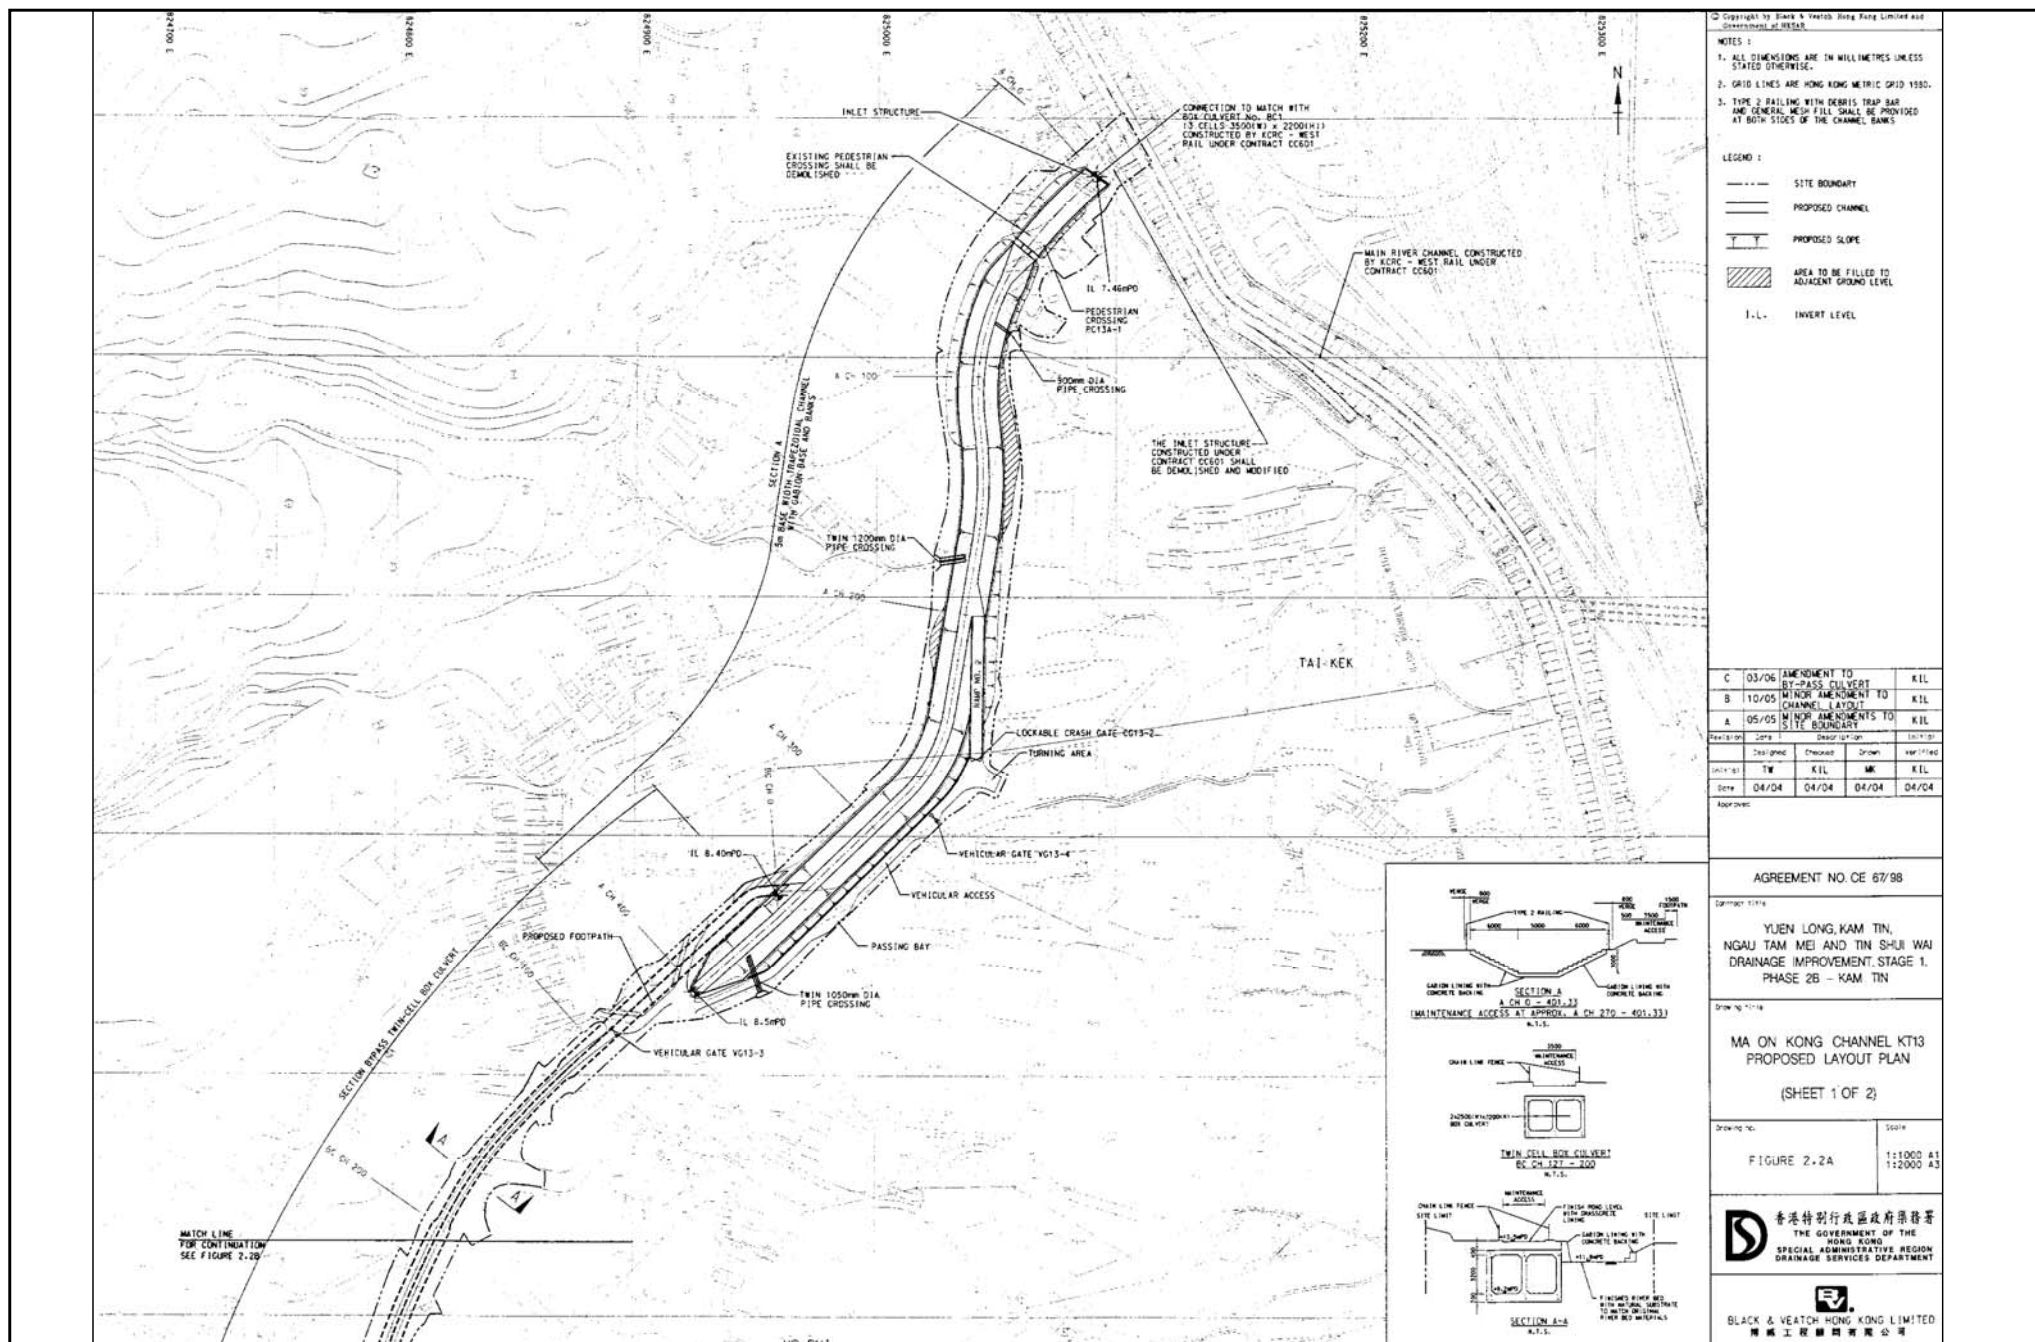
Proposed Layout Plan (Northern section of KT13) [Adopted from Figure 2.2A in EIA Report]
